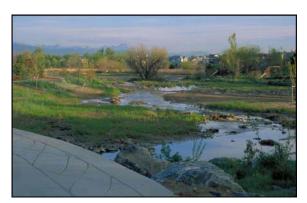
Downstream View from Holly Street toward Lower Drops No. 2 and No. 3
